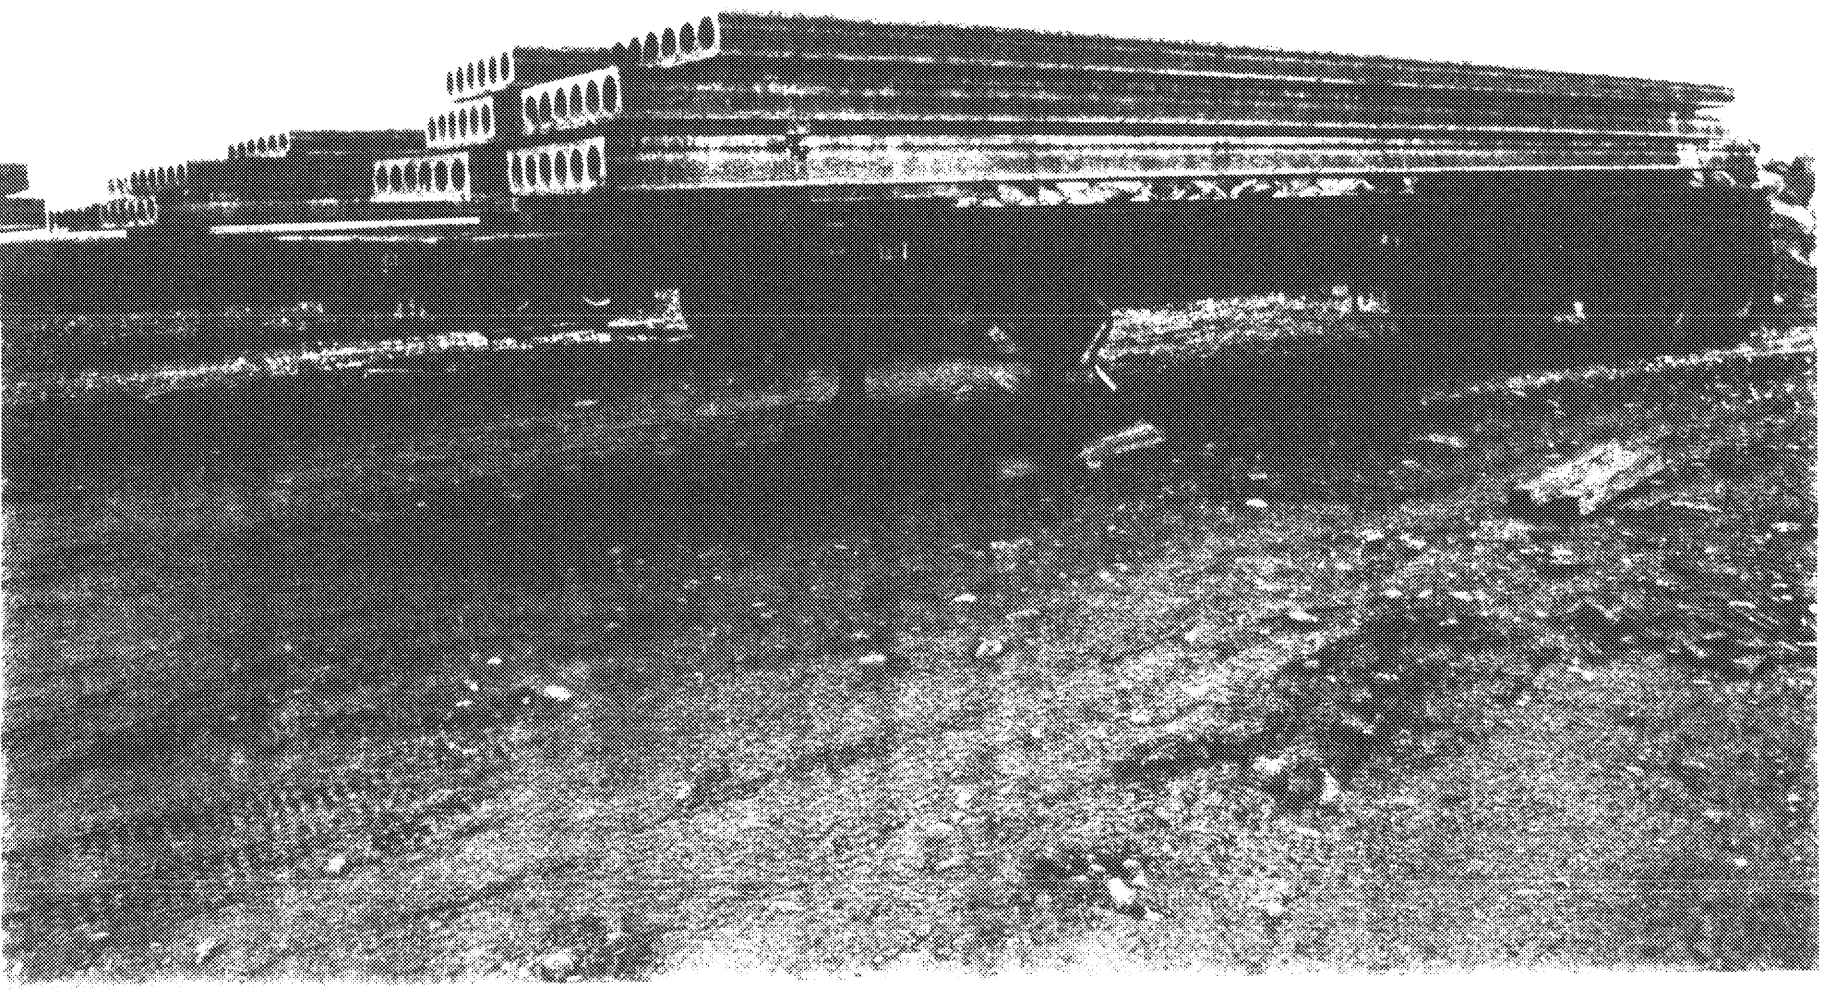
Concrete Panels for Covers 1301-N/1325-N
